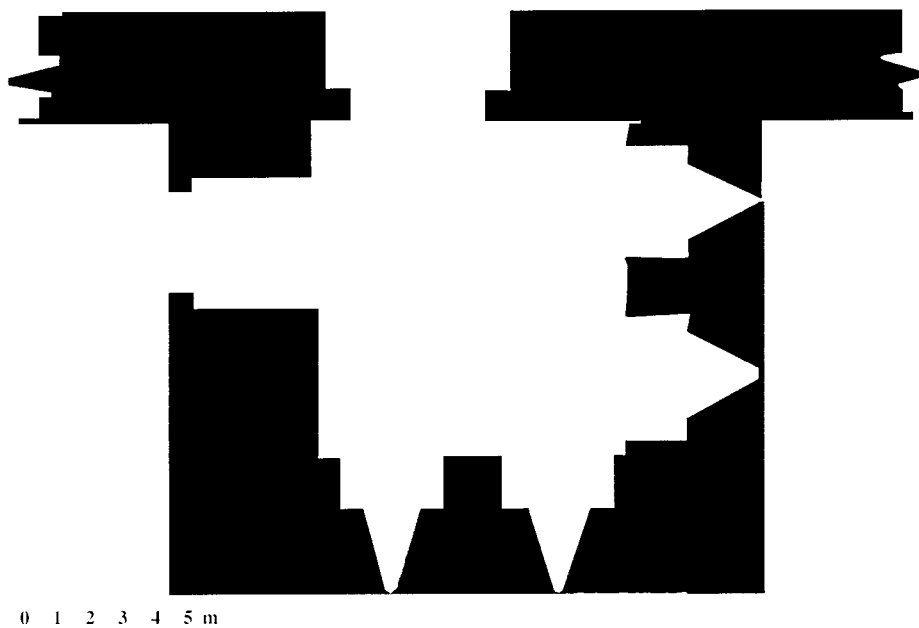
Plan of the Tanners' Gate (after Ben-Dov 1983).
